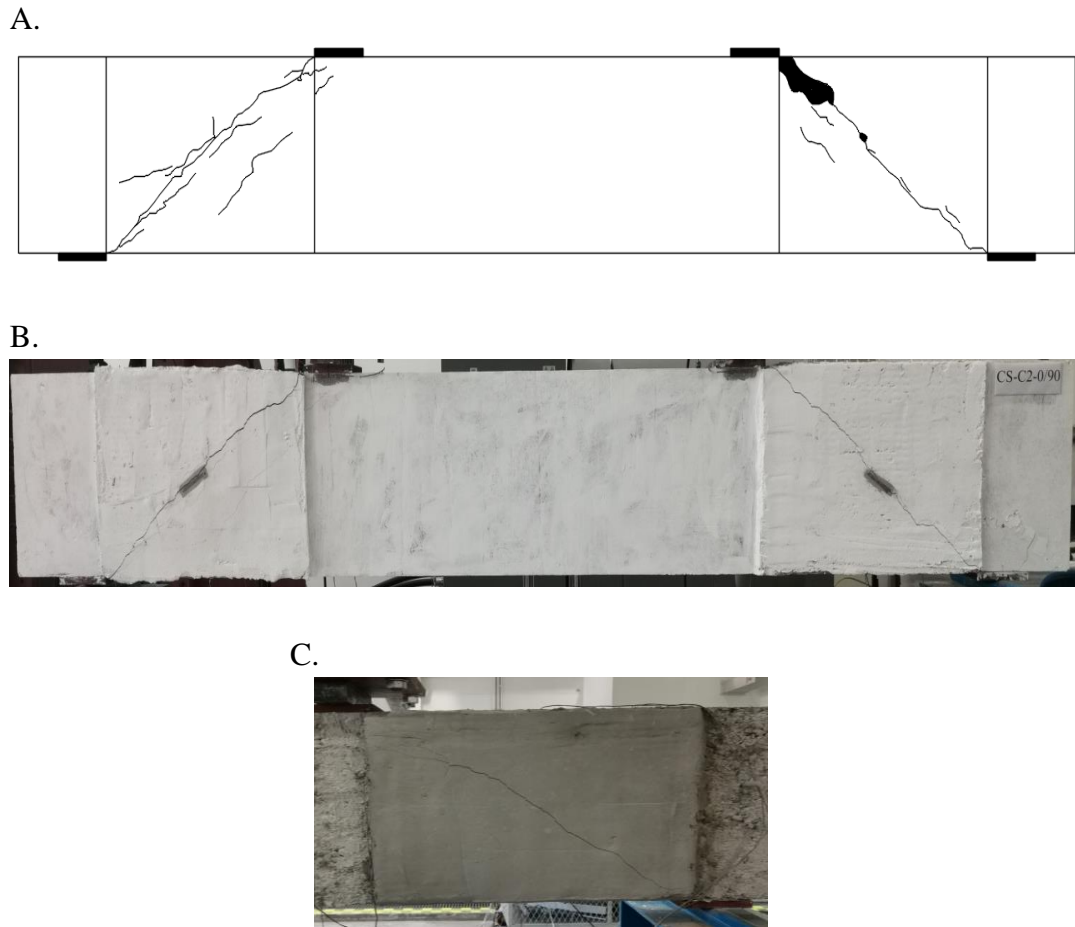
Crack pattern of specimen ST-C2-0/90: A. Schematic drawing of the crack pattern, B. Picture of the beam at failure, C. Close view of the crack pattern (east shear span)
